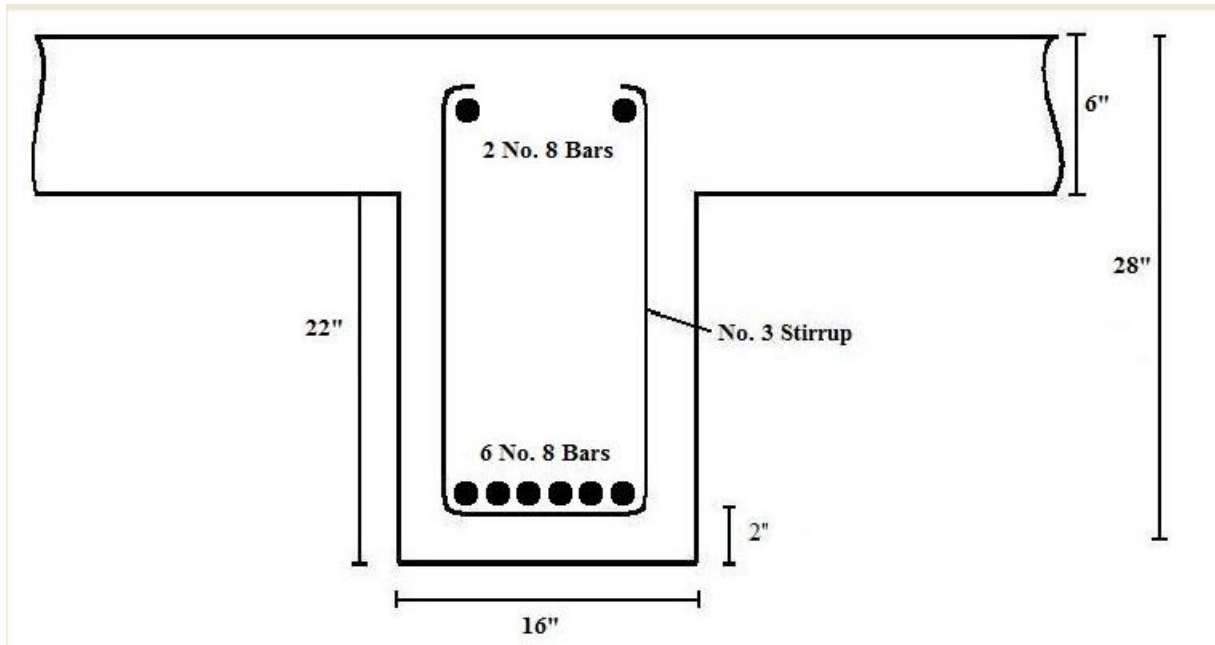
Typical Slab and T-Beam Design for Reinforced Concrete Frame
